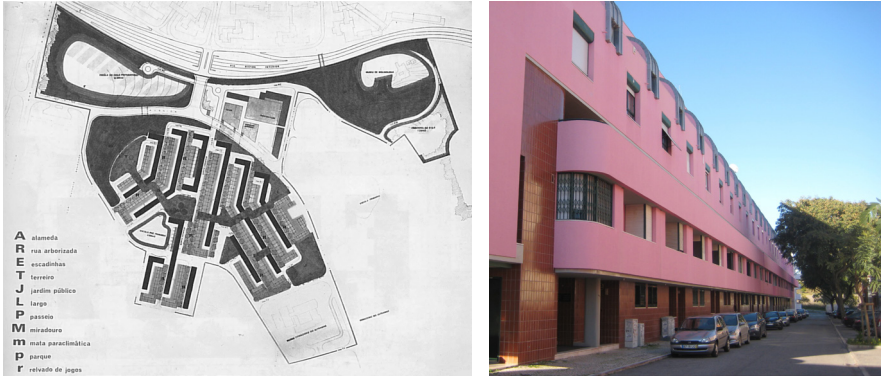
Restelo Detail Plan (left) and housing complex (right).
